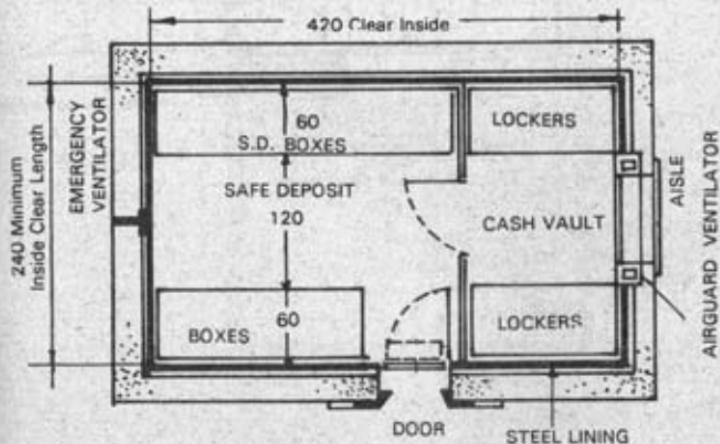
PLAN OF A SINGLE AISLE VAULT
